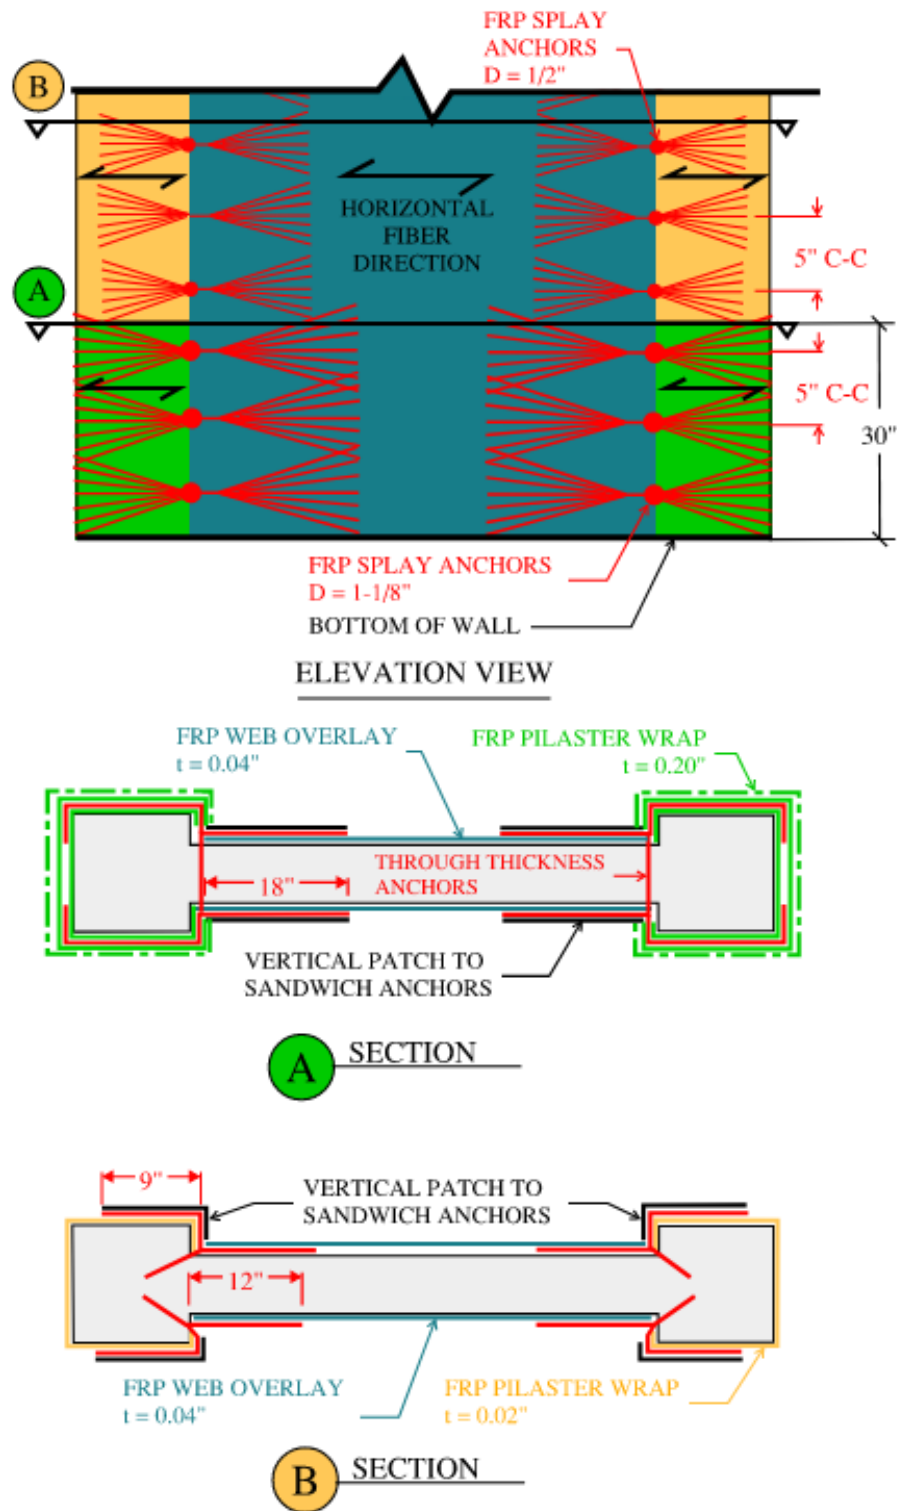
Elevation and Plan View of S2FL FRP Retrofit Details
